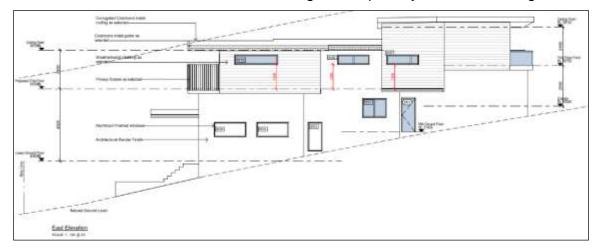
East Elevation showing High Sill Windows & Privacy Screen
